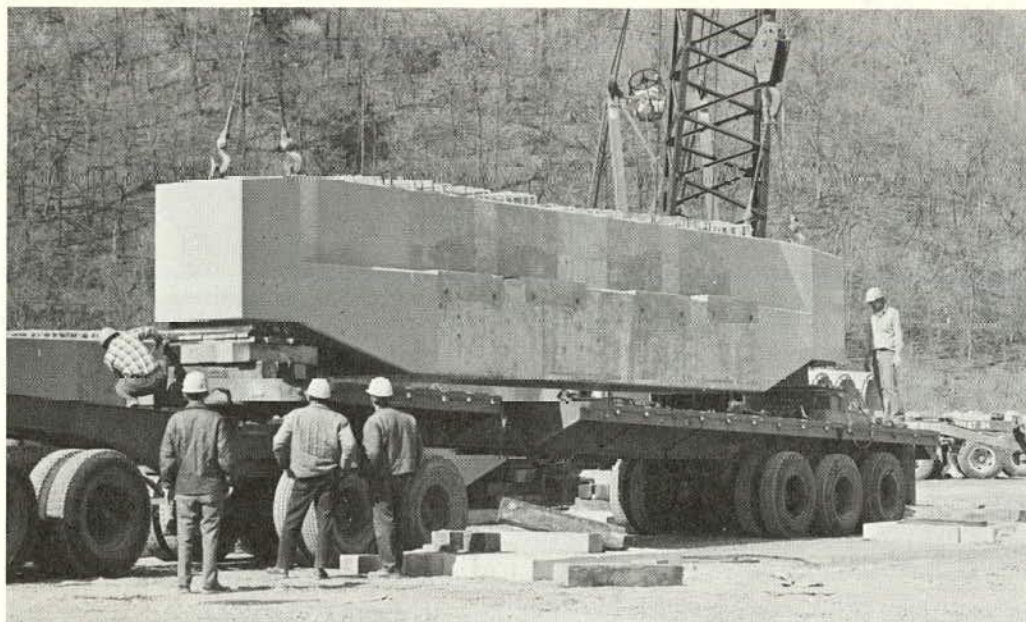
Precast post-tensioned pier cap (Pennsylvania).
